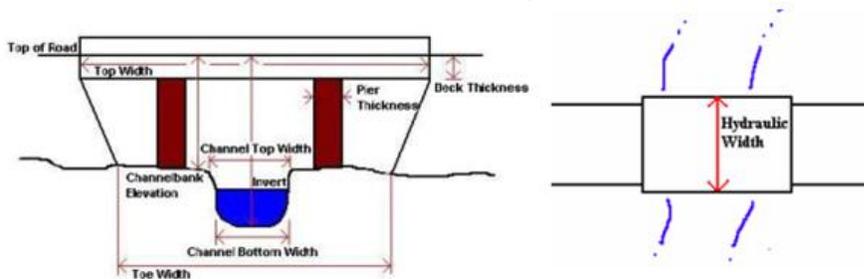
Rapid Field Survey - Bridge Rod Measurements & Hydraulic Width of Bridge
